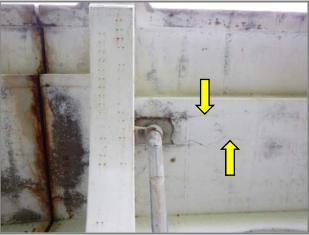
Spall with three layers of exposed reinforcement at the right side of Photo 4 – Typical heavy rust staining in the deck underside below the the deck underside (looking northwest at the West Pylon).
